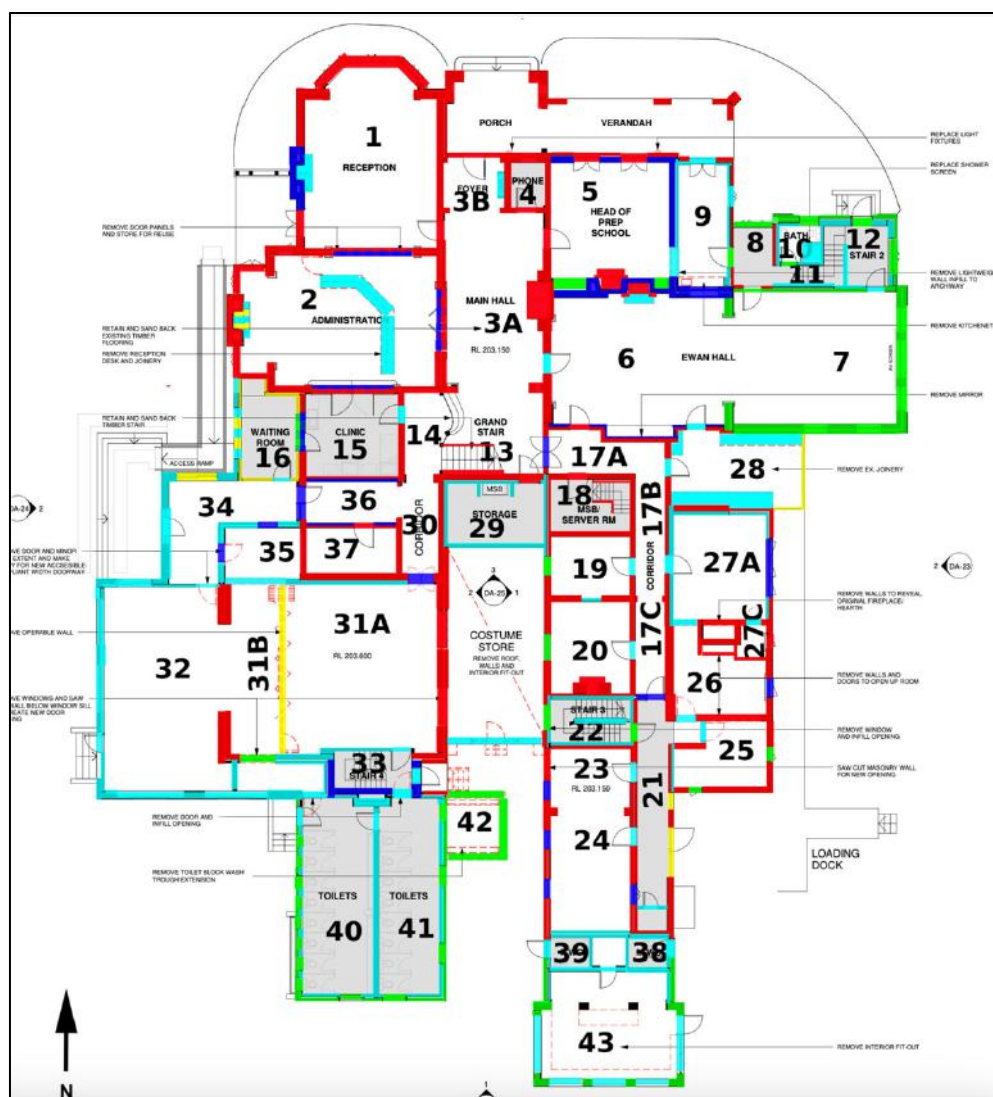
Ground floor fabric survey. Note this set of plans is no longer in date with respect to the scope of works and should not be used as a reference for the current proposal.
